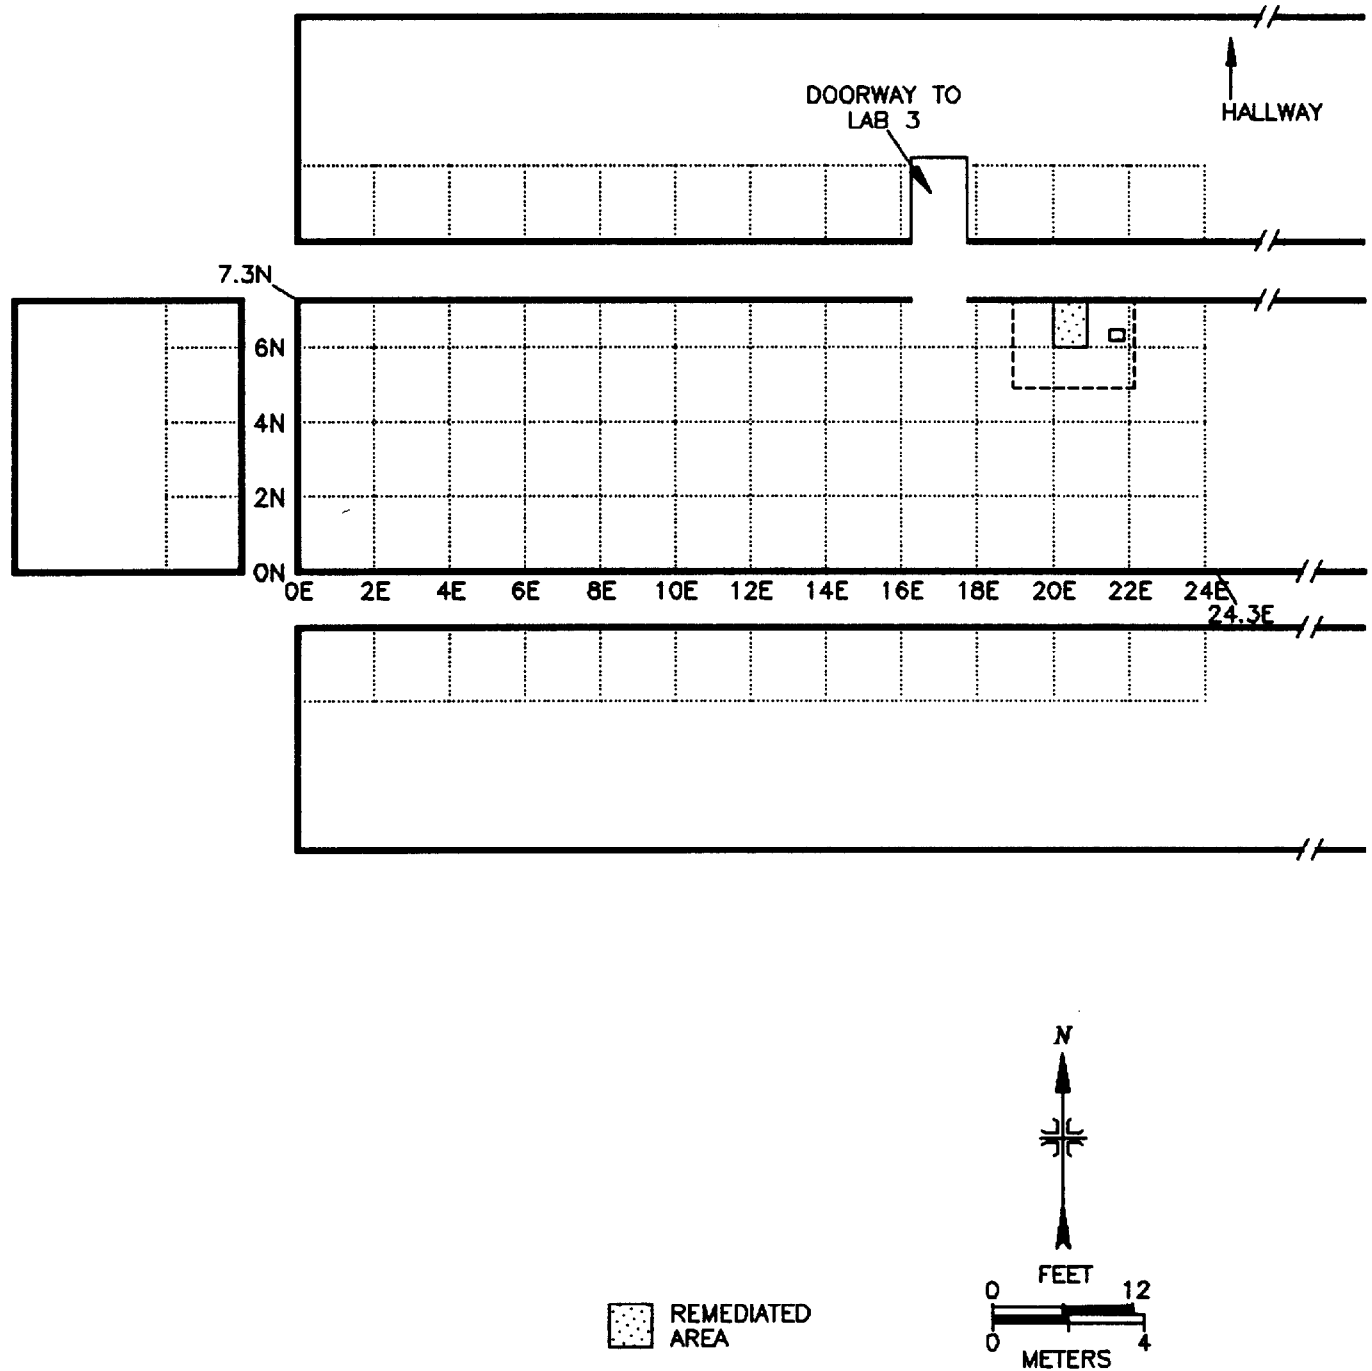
Building 28, First Floor Hallway Outside Lab 3
